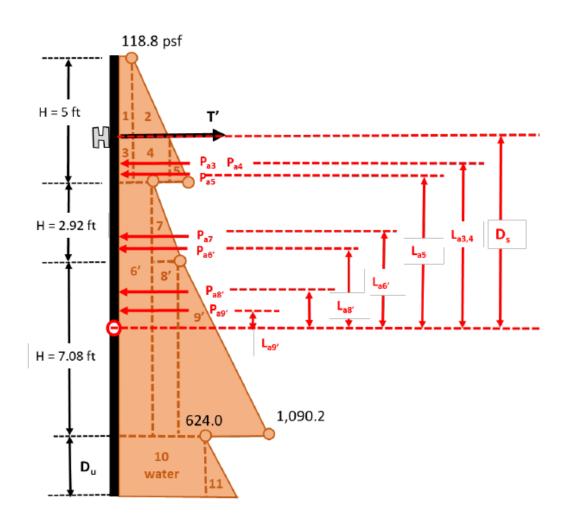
Determination of zero-shear location on sheet pile wall.
